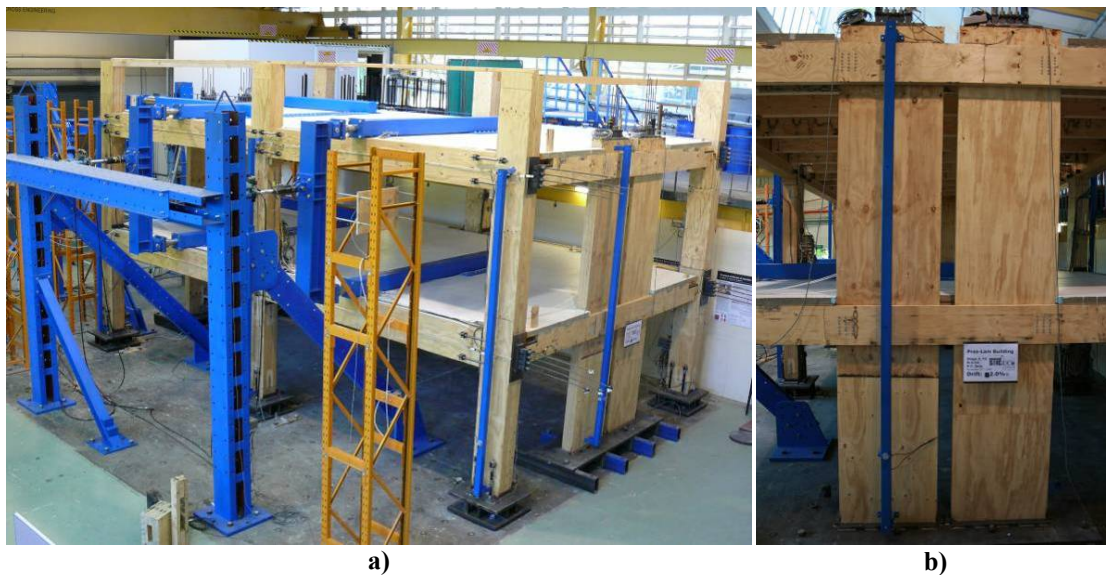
Wall at 2.0% Drift a) 3D view b) E walls
